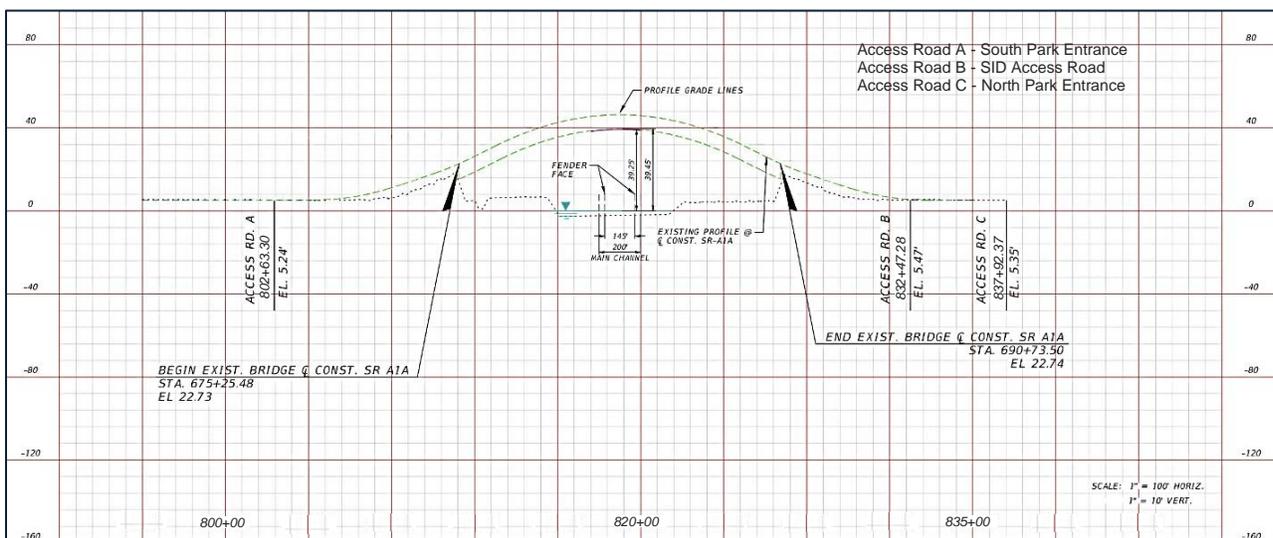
EXISTING BRIDGE PROFILE SECTION
